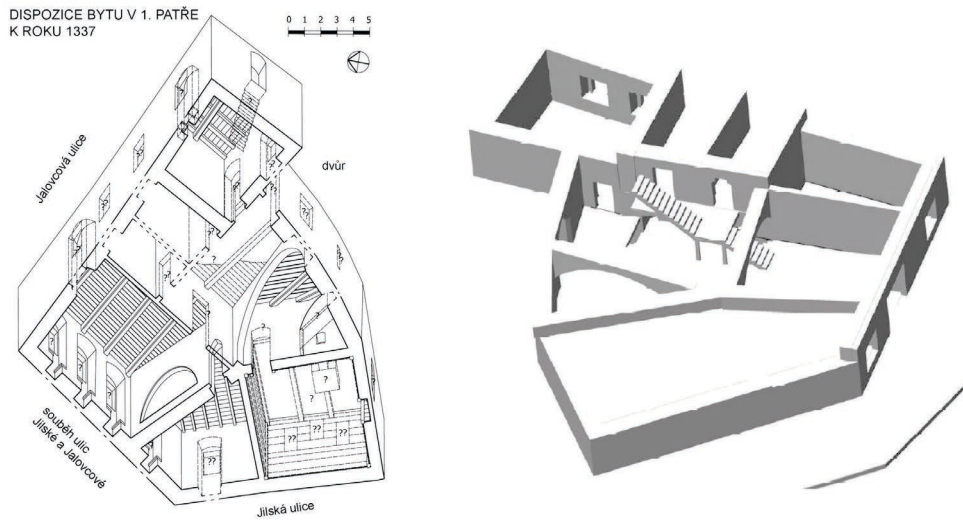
House no. 234 in the Old Town of Prague; building archaeology by M. Rykl and J. Beránek. Reconstruction of the appearance at the time of construction (1337 according to dendrochronology). Left: isometric drawing of the main apartment on the 1st floor; graphical assistance (AutoCAD) K. Knotová Right: ground floor and living space in the mezzanine; computer model J. Vašek, 2005.
